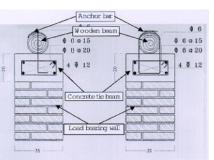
B: Wall cross-section showing a concrete tie beam ad roof-to-wall connection
